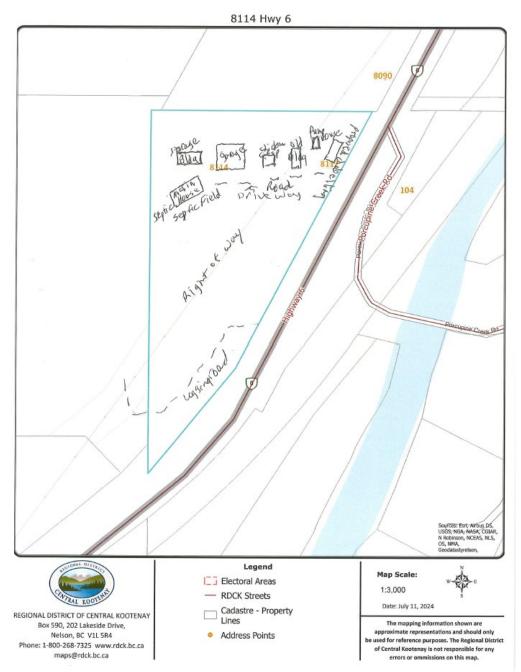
Site Plan showing existing buildings and the potential location of a future Accessory Dwelling Unit
